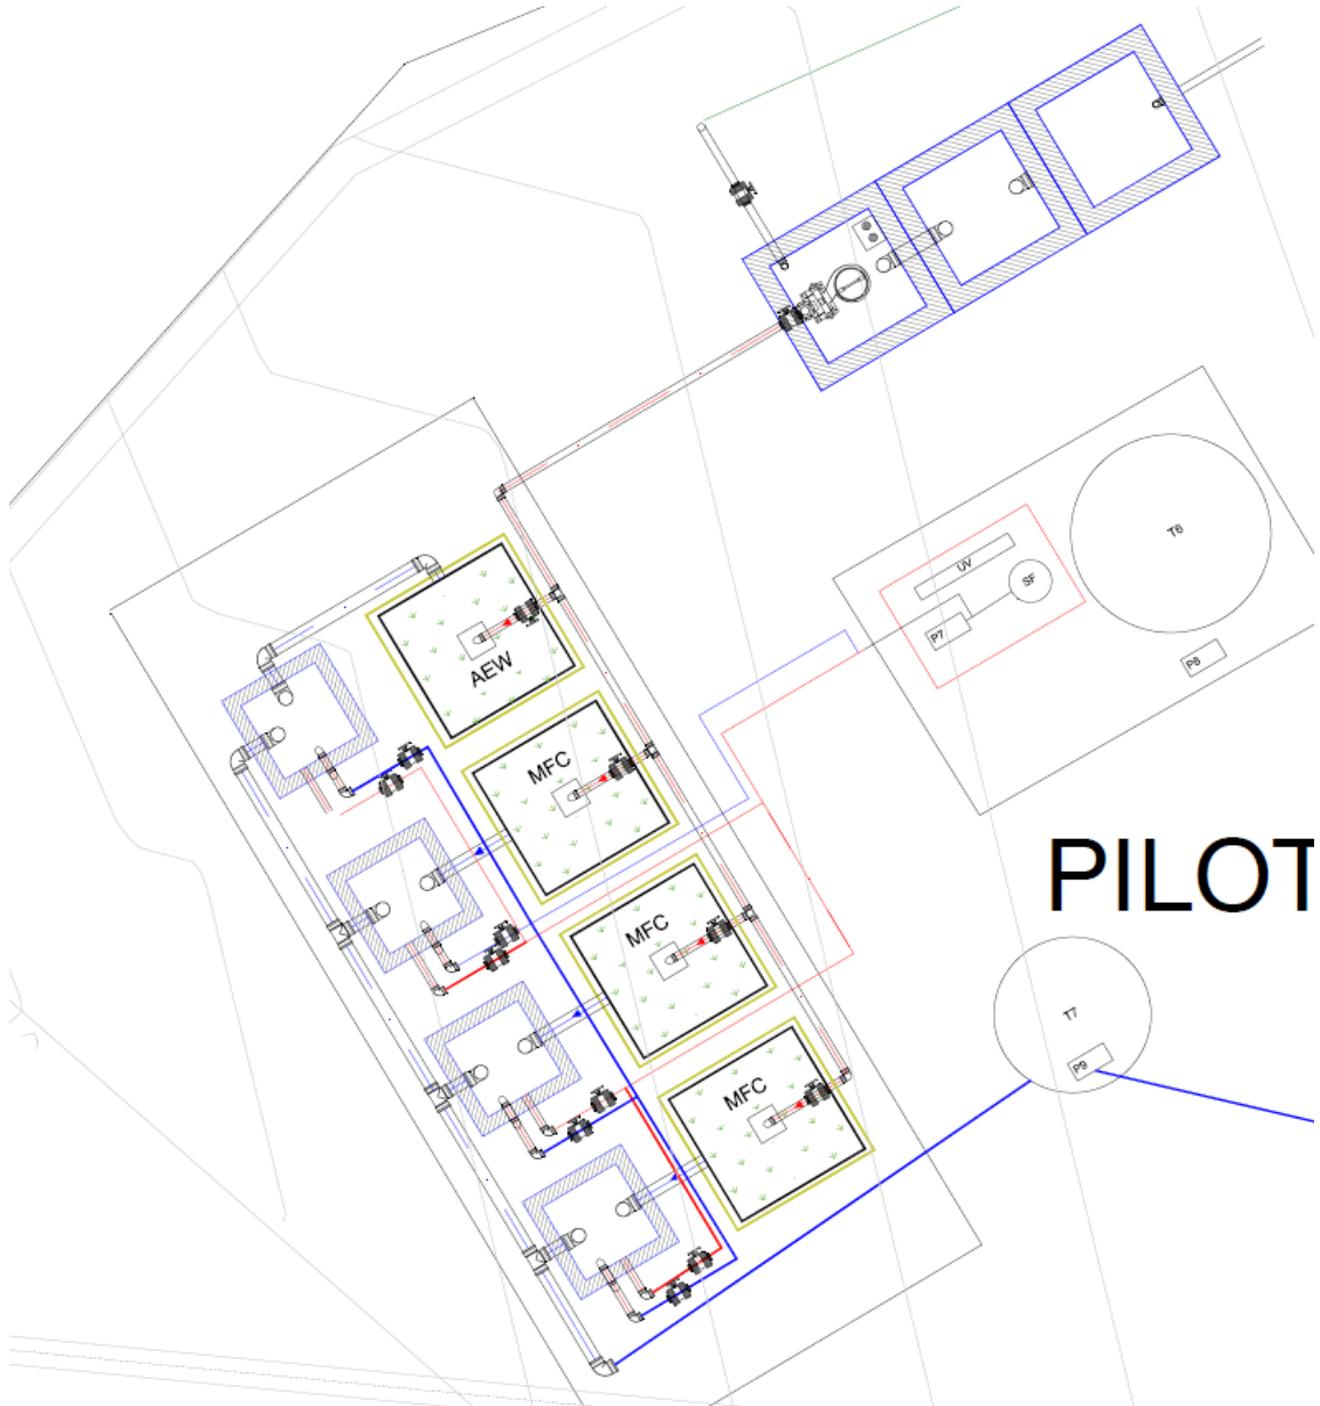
Layout of Lesbos pilot scale system – final detailed design
